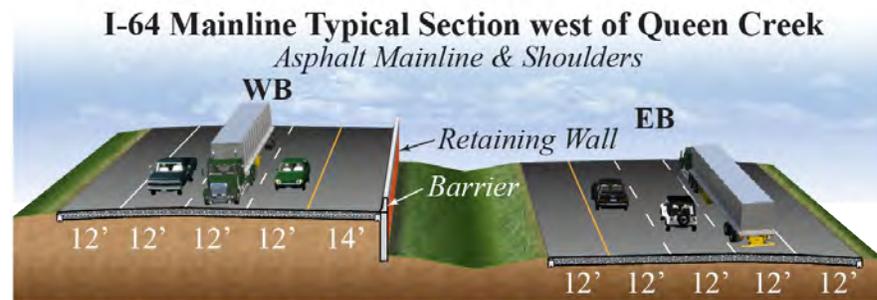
Asphalt Mainline and Shoulders with TL-5 Barrier. This typical section allows us to minimize traffic disruption and reduce costs over bridge replacement.
